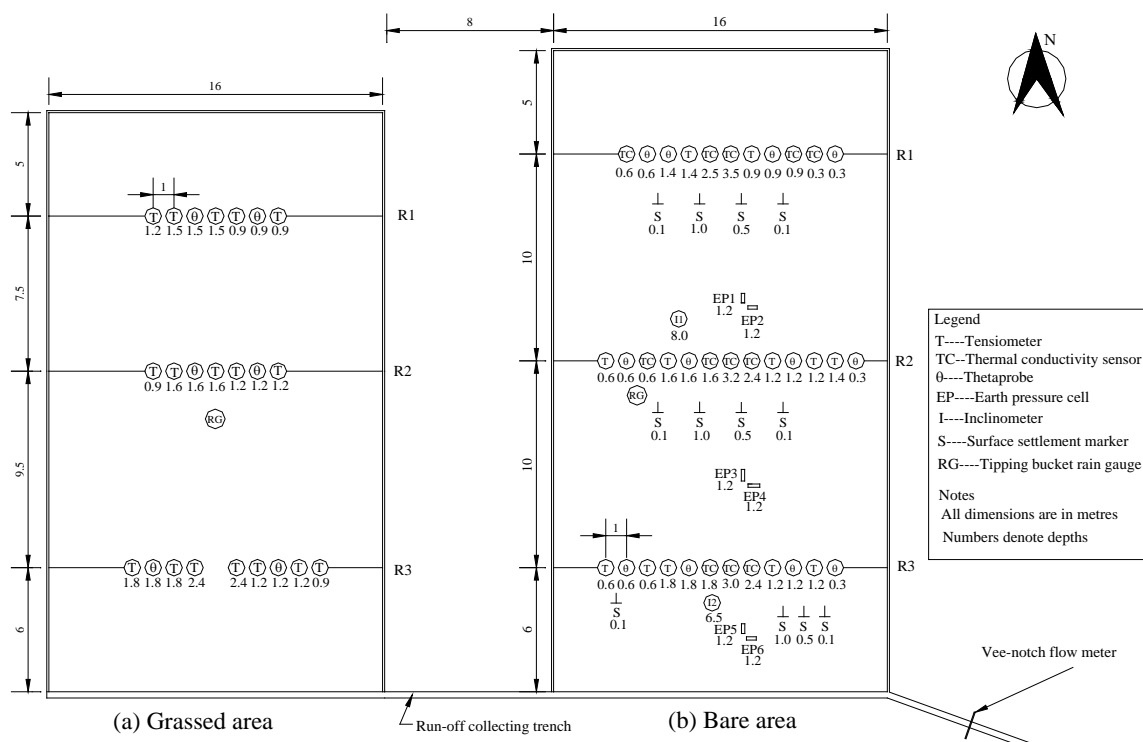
Layout of instruments on the expansive soil slope in: (a) Grassed area and (b) Bare area (Ng et al., 2003 and 2009)
